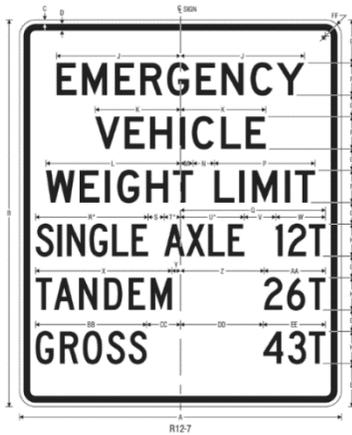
Load Posting Sign for Emergency Vehicle Load (Source: ADOT Bridge Load Rating Guidelines)
